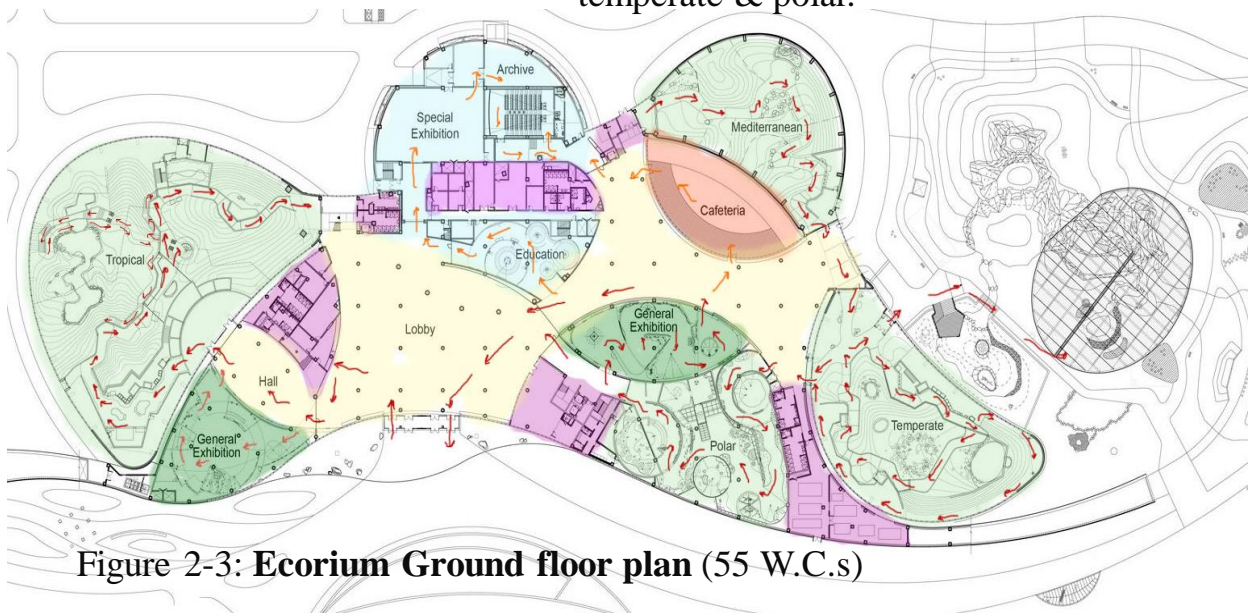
Ecorium Ground floor plan (55 W.C.s)
